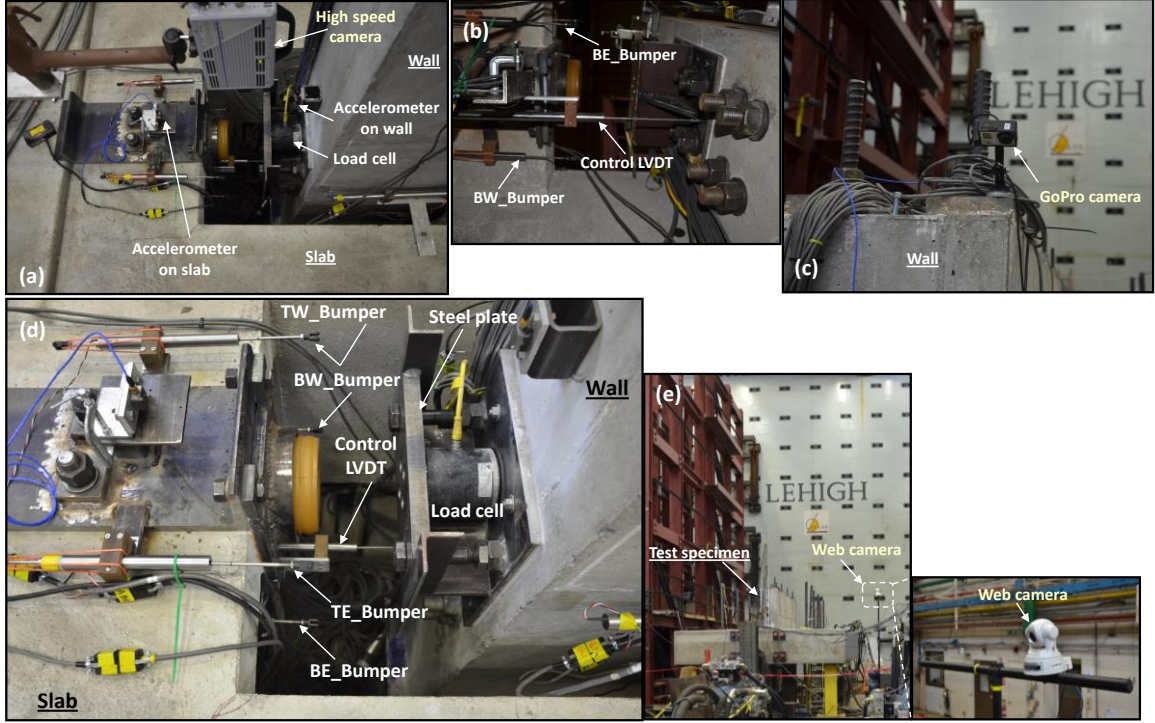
Instrumentation plan: (a) top view - zoom out; (b) bottom view; (c) GoPro camera at the wall top; (d) top view – zoom in; (e) location and zoom in of the web camera.
